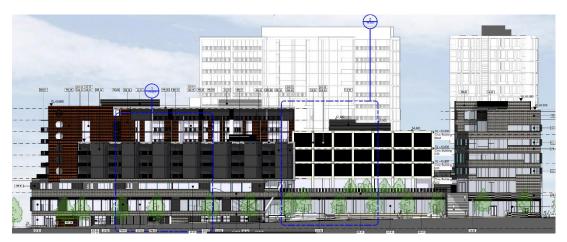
Previous amendment Mills Boulevard (Eastern) elevation
